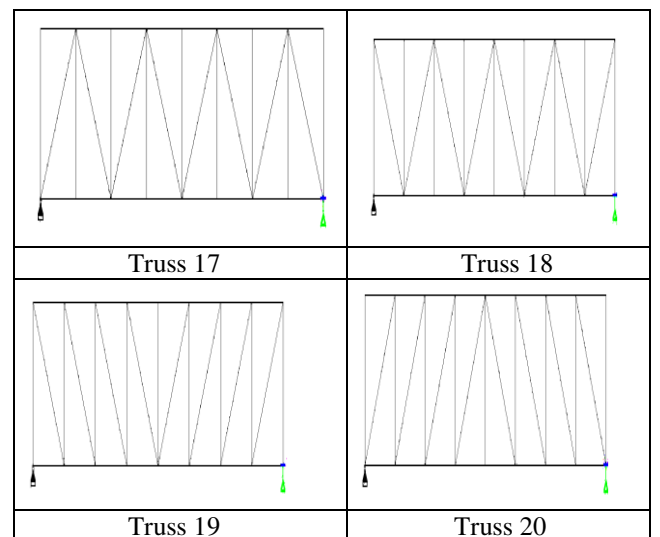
Trusses with horizontal top chords [Truss 17 to Truss 20]
